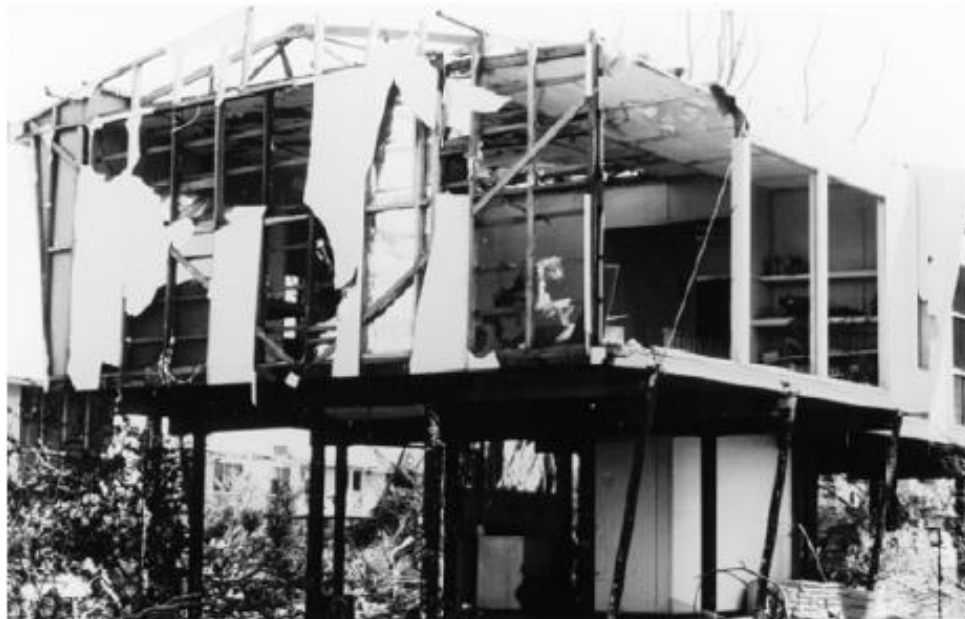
The damaged wall cladding (Walker, 1975)
